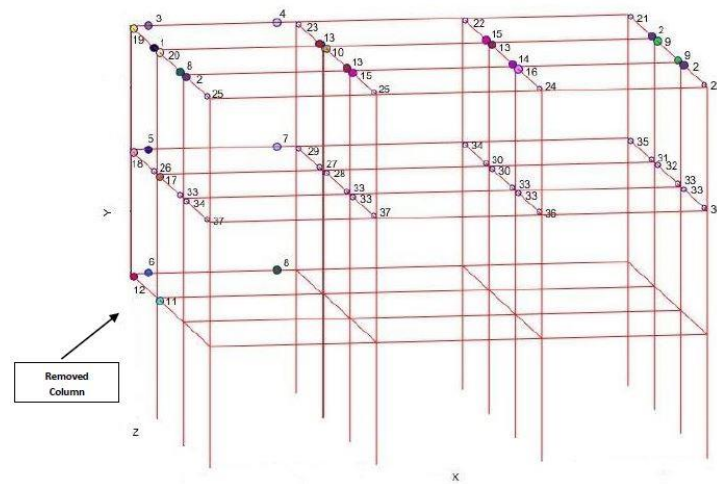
Distribution of collapse in 3-story building in presence of earthquake record #169
